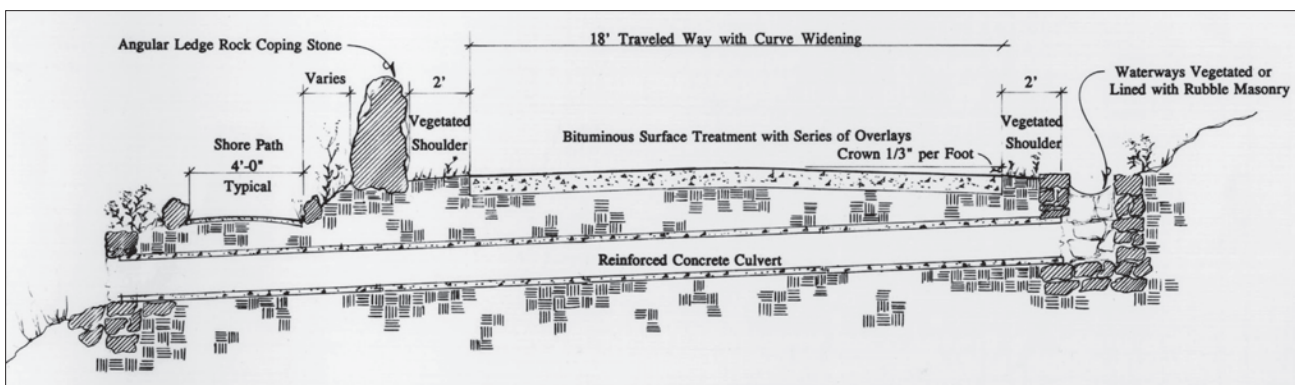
Illustrative section showing pavement, drainage, coping stone and path, Eagle Lake Motor Road, Acadia National Park, 1993. (Foulds/NPS 1993)
